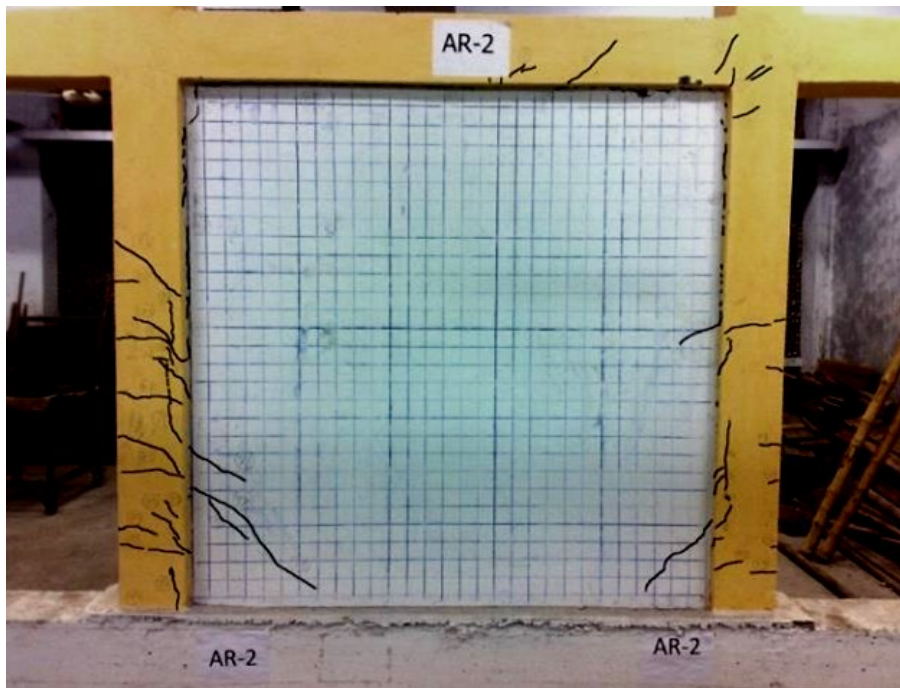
(b) Crack patterns at peak load in repaired brick infilled RC frame model specimen AR2
